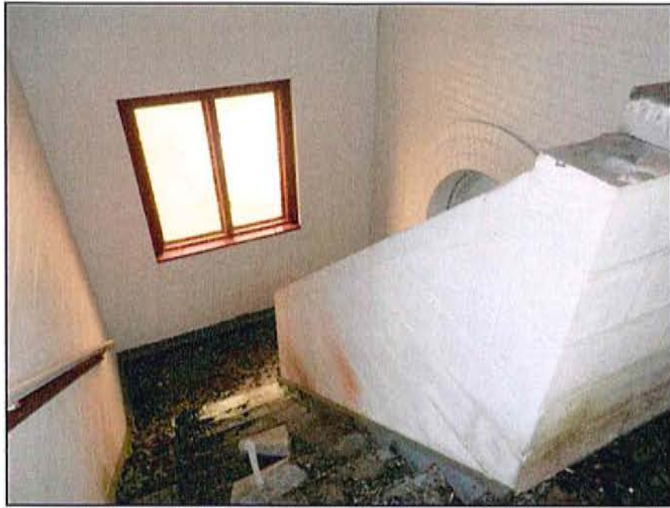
3<sup>rd</sup> Floor, collapsed stairs, northwest
